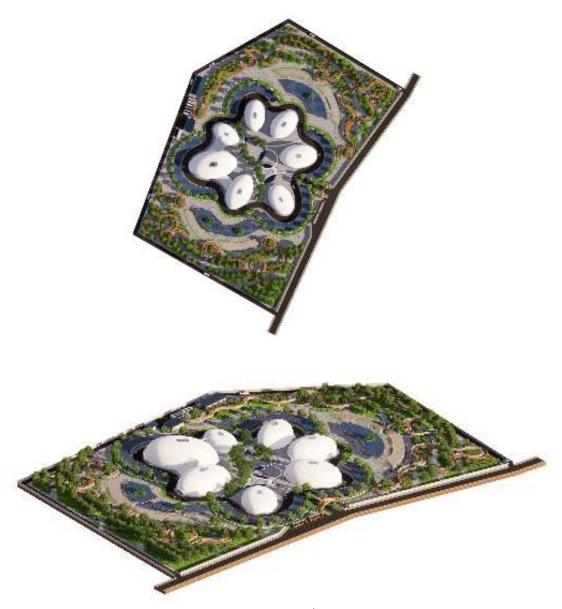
Siteplan Layout (Source: Author's Concept, 2024)
